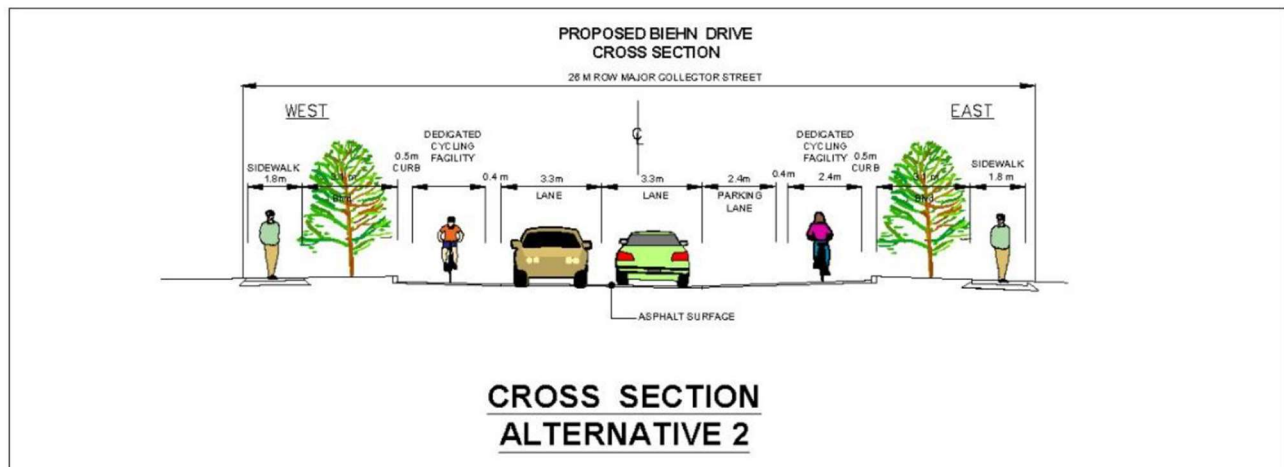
Cross Section Alternative 2 (Beyond the Wetland)
